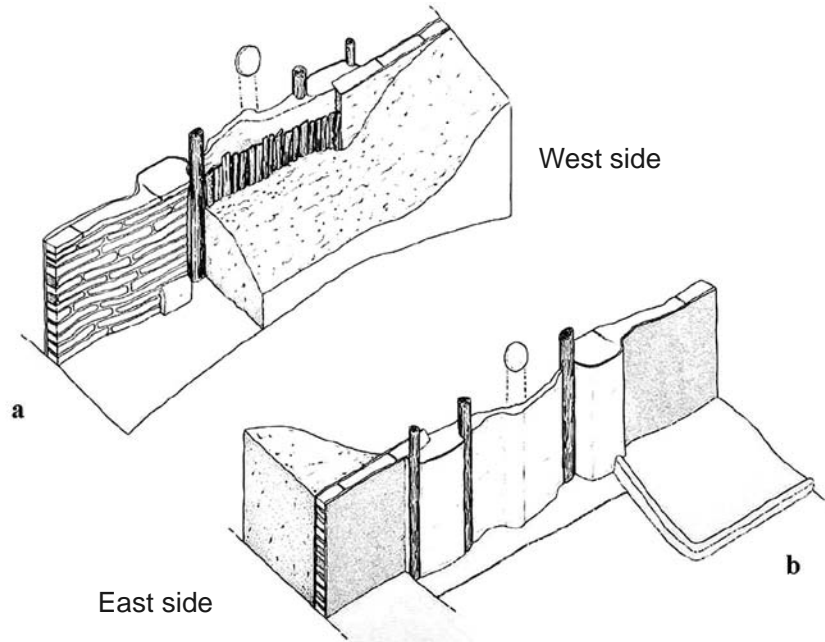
Artist's reconstruction of the north-south screen wall (F.601) in Building 3, constructed in Phase B3.4B, by John Swogger: (a) looking from above toward its west face; (b) looking from above toward its east face.
